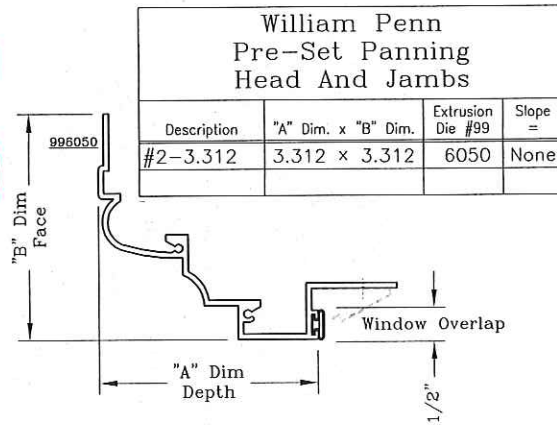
/8 Scale - For Custom Size Drawing Contact Graham
